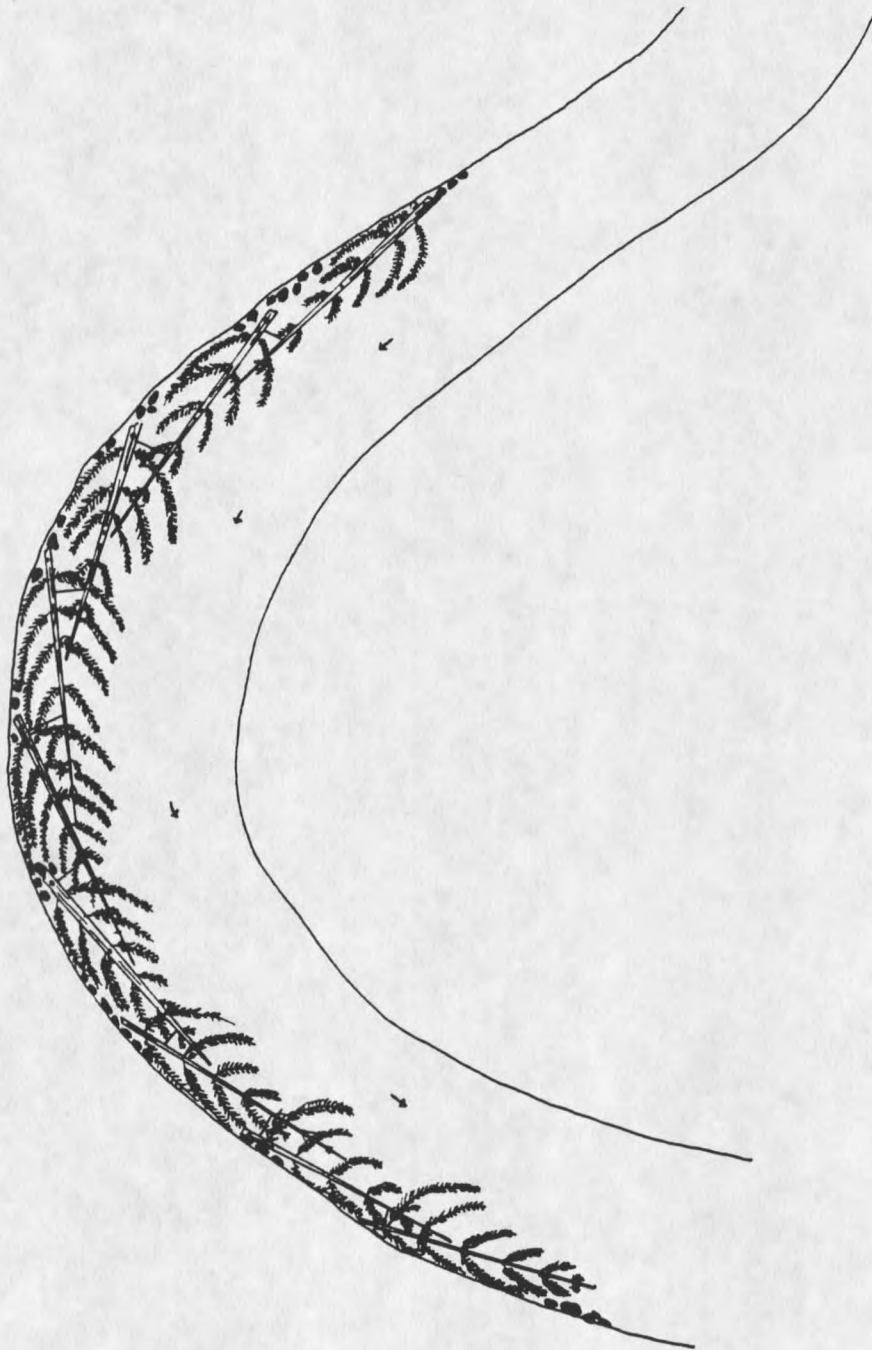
Typical Deep Creek bend after installation of tree revetment.
